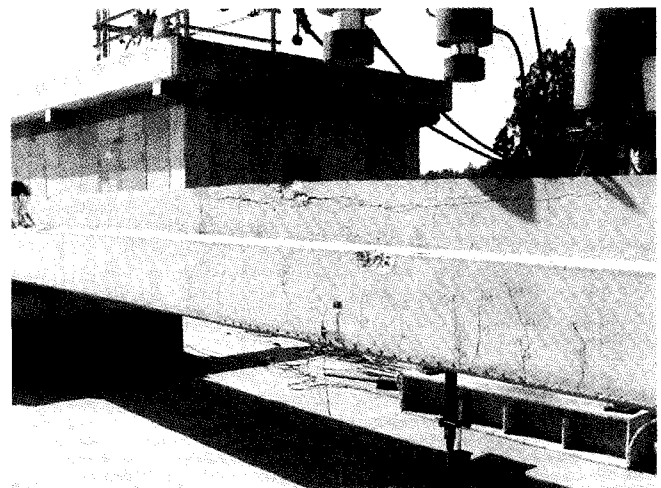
Example of flexural failure with local compression crackings (IB500-1)
